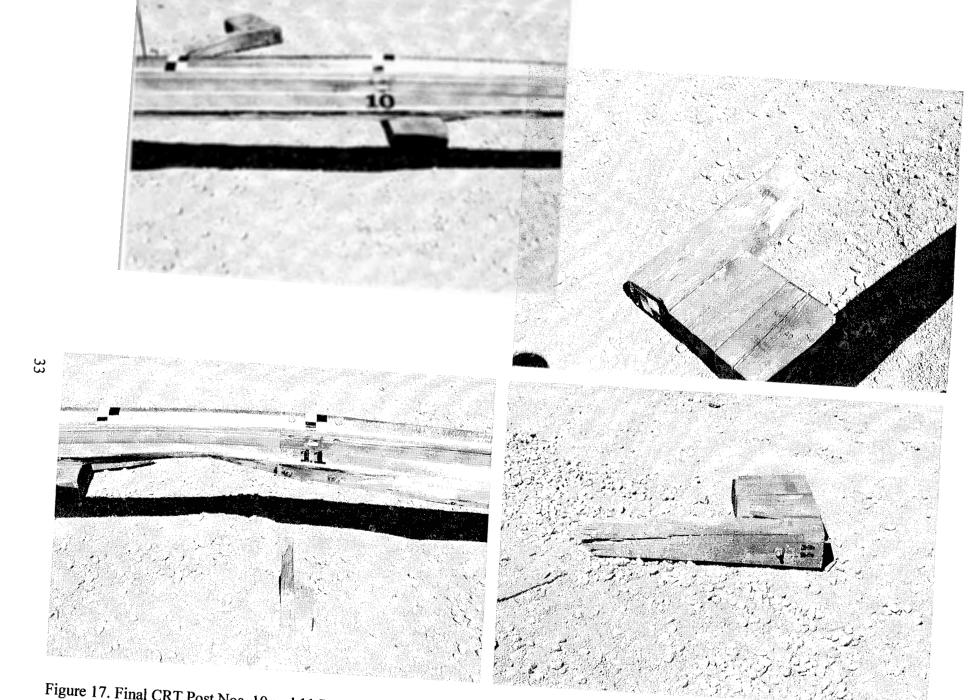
Final CRT Post Nos. 10 and 11 Positions, Test OLS-3 (Design No. 3)
